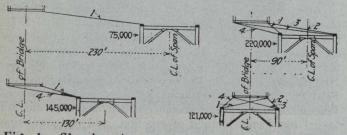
Showing Arrangement of Mooring Lines from Each End of Suspended Span to Adjacent Mooring Truss
